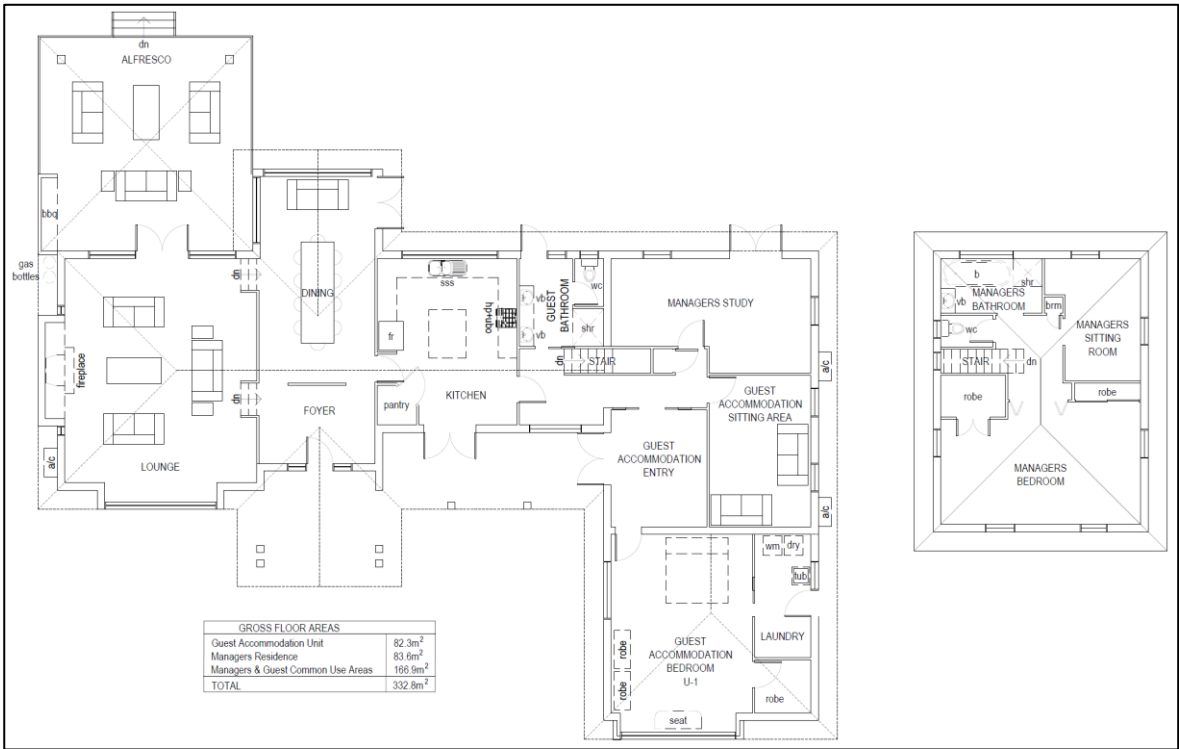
Ground and First Floor Plans for Manager's Residence and Guest Accommodation
